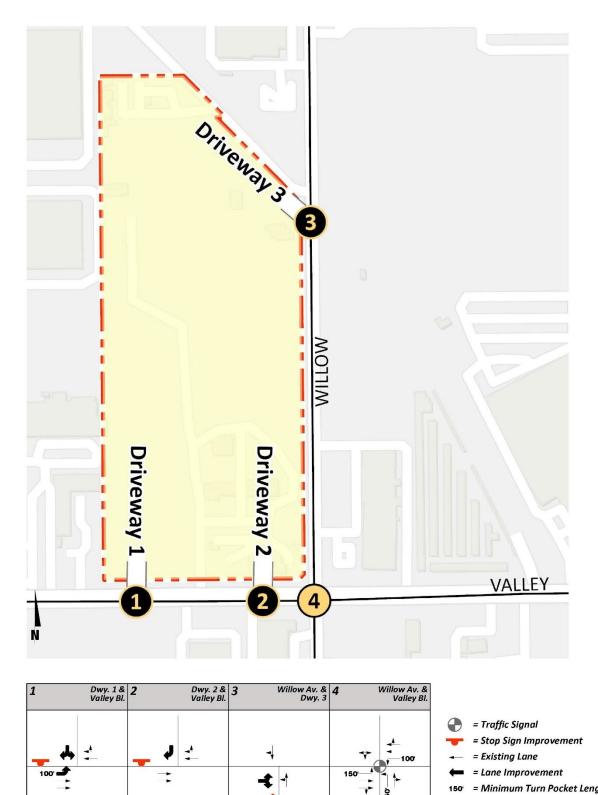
SITE ADJACENT ROADWAY AND SITE ACCESS RECOMMENDATIONS
